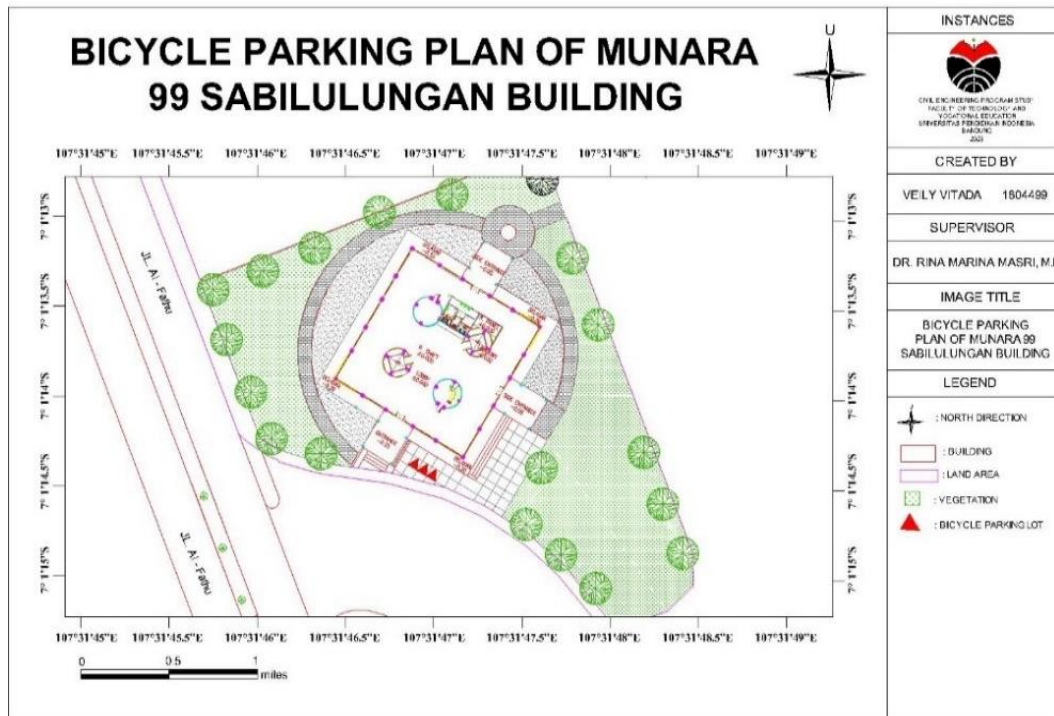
Bicycle Parking Plan at Munara 99 Sabilulungan Building.
